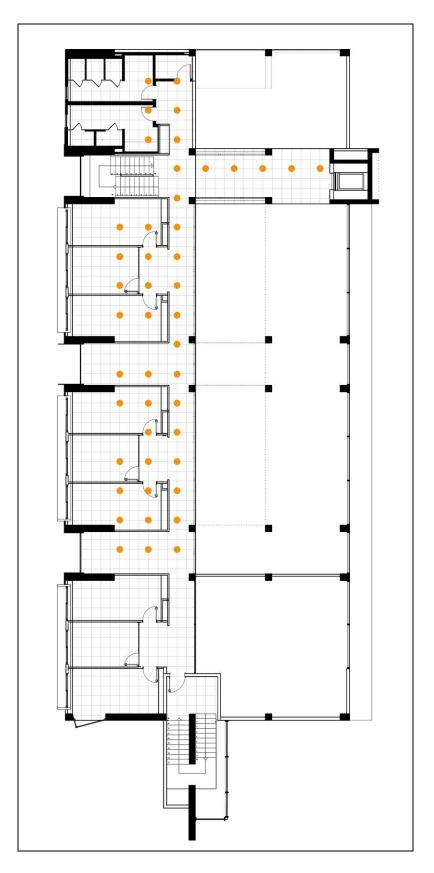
Fingerprints on Test Bed Environment, scale: 1/200 (Second Floor of MATPUM Building)
